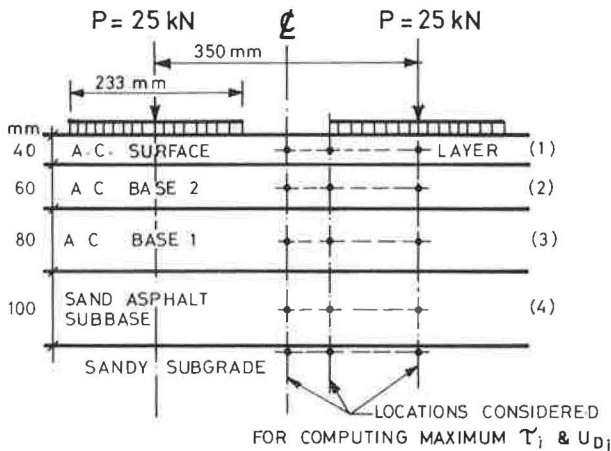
Asphalt pavement structure analyzed for a standard dual wheel load system.
